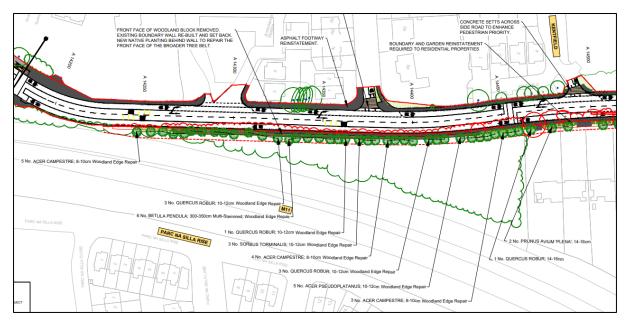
Extract from Landscape General Arrangement Drawings (Sheet 41)
